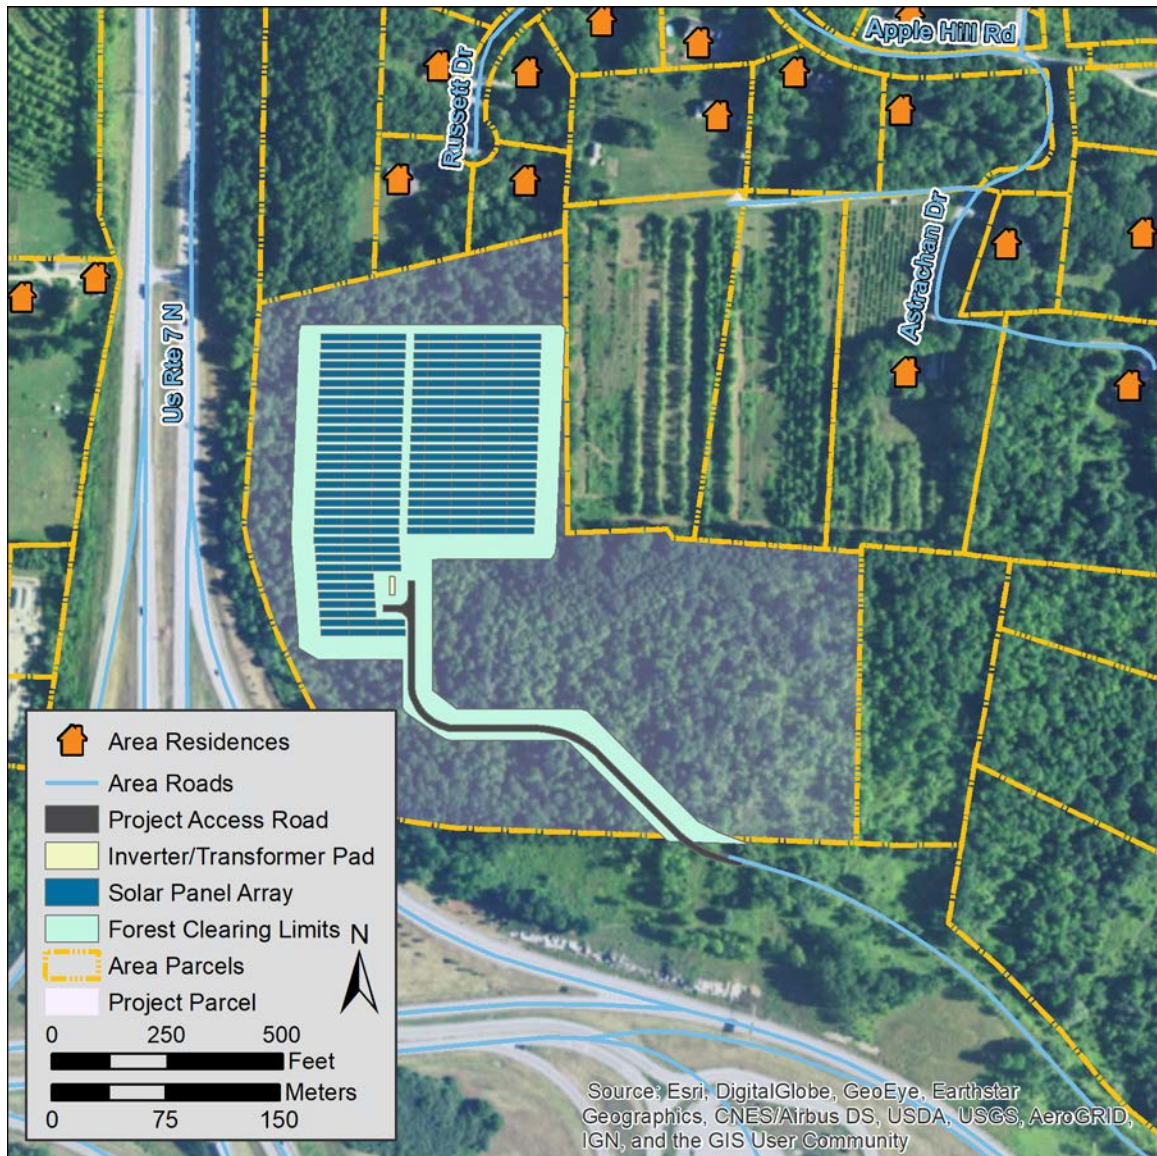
SITE LAYOUT OF THE PROPOSED SOLAR FACILITY
